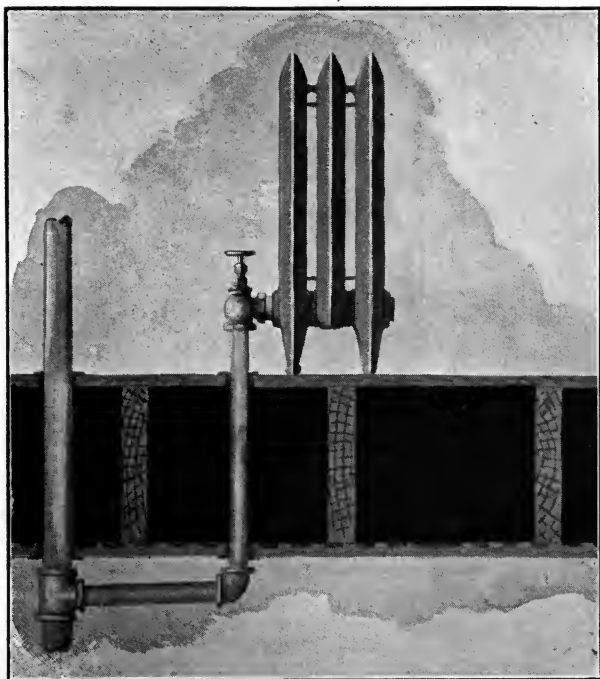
Sometimes Used on Upper Floors, Horizontal Pipe Exposed Below Ceilings Is An Objection. Will Do for Store Undecorated Rooms.
